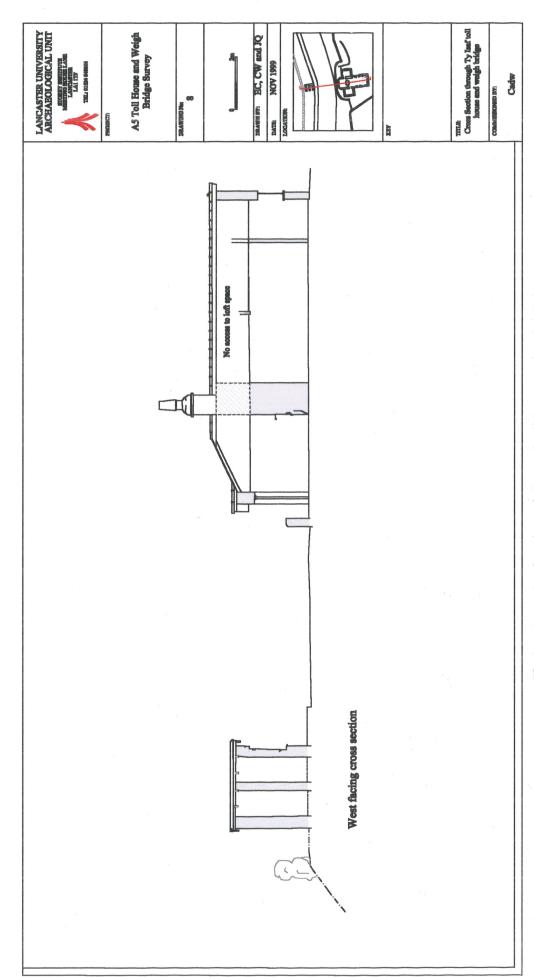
Cross Section through Ty Isaf toll house and weigh bridge
